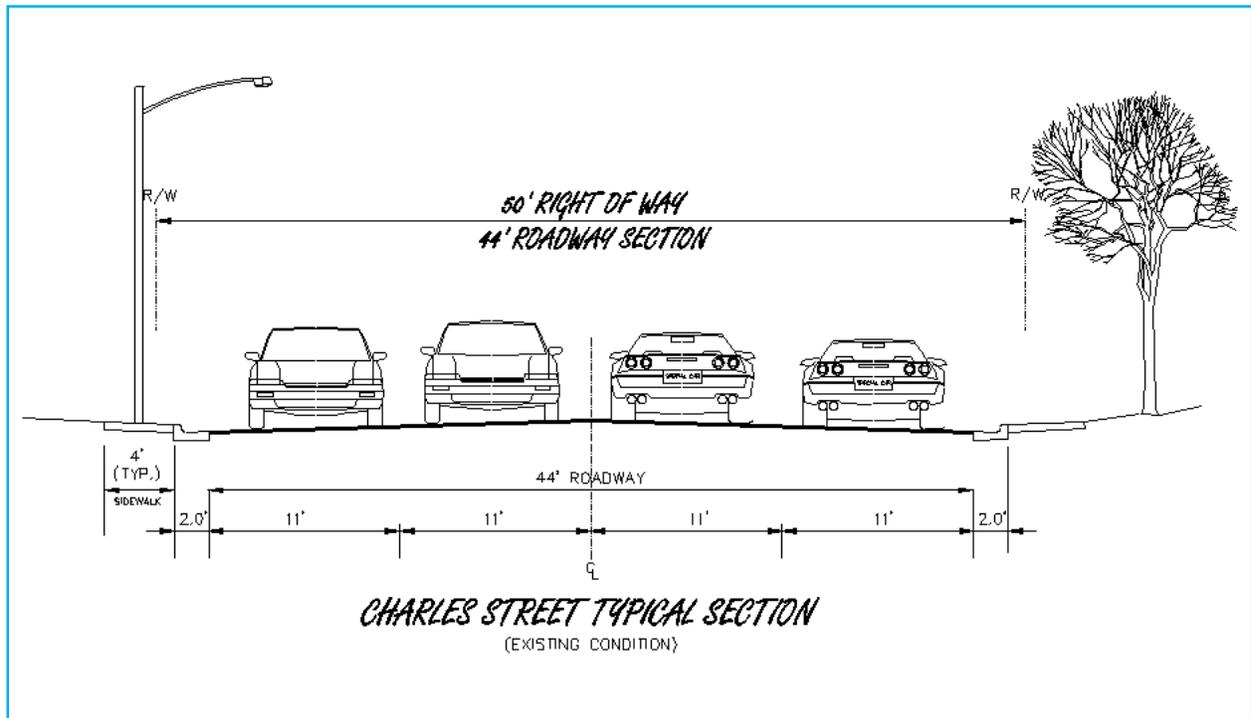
CHARLES STREET TYPICAL SECTION – 50’ R/W – 44’ PAVEMENT WIDTH – RT 301 TO WILLOW LANE
